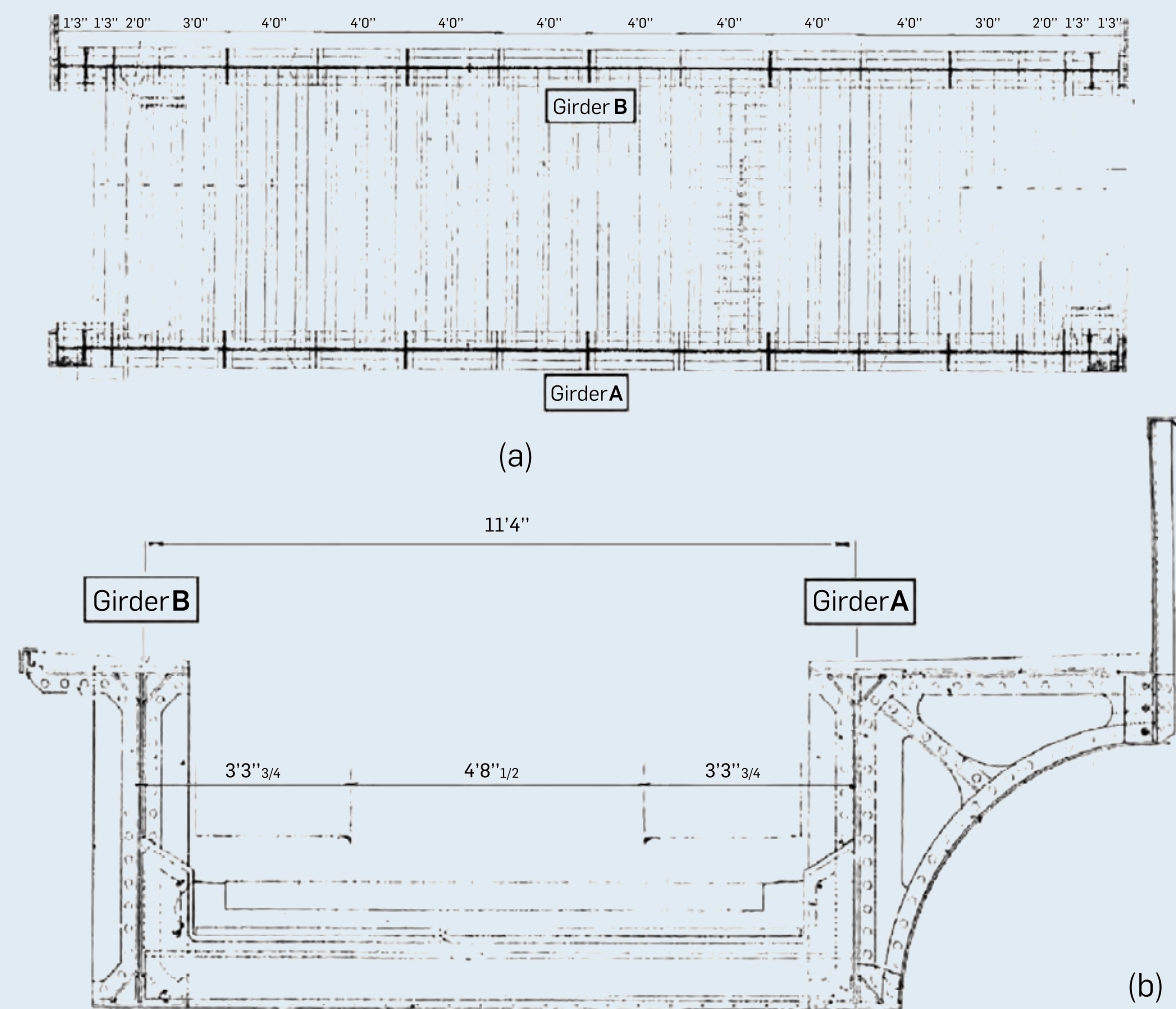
Plan View (a) and Cross Section (B) of the Warton Road Bridge
